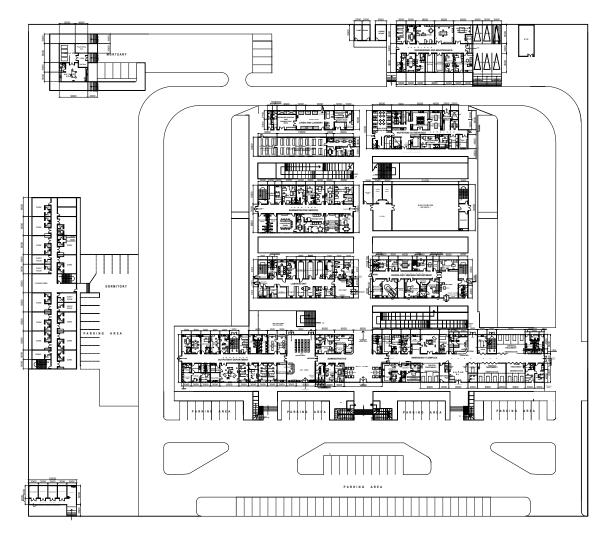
One-Storey, 100-Bed Hospital Level Two: Floor Plan
